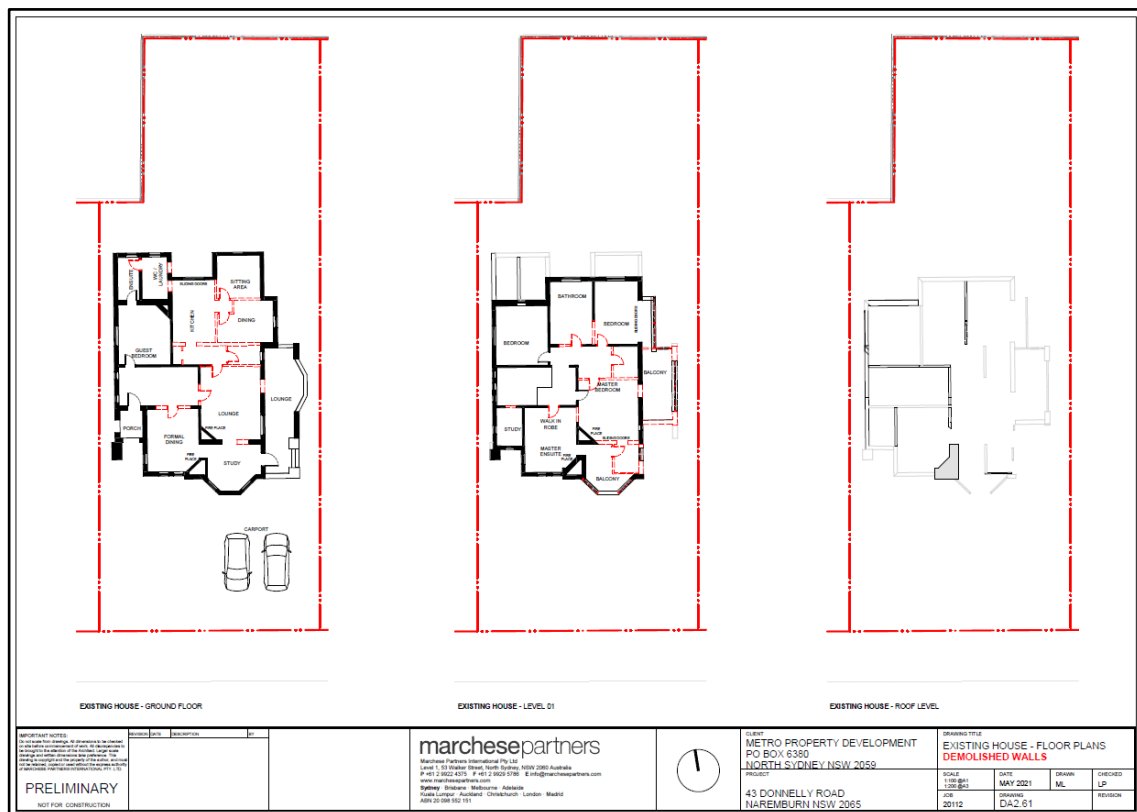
Demolition plans showing the internal changes to the existing presbytery.
